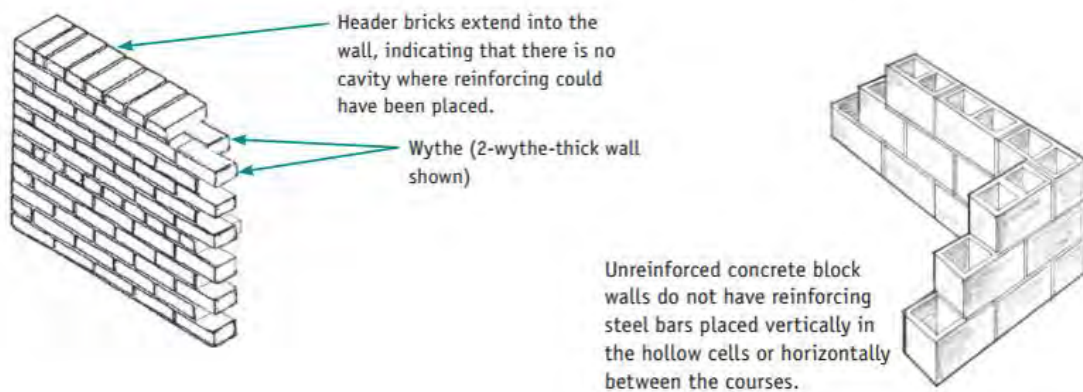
Components of unreinforced brick (left) and unreinforced concrete block (right) walls
